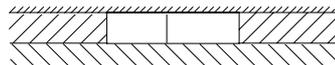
Types and application of cable trunking systems and cable ducting systems for underfloor and flushfloor installations
